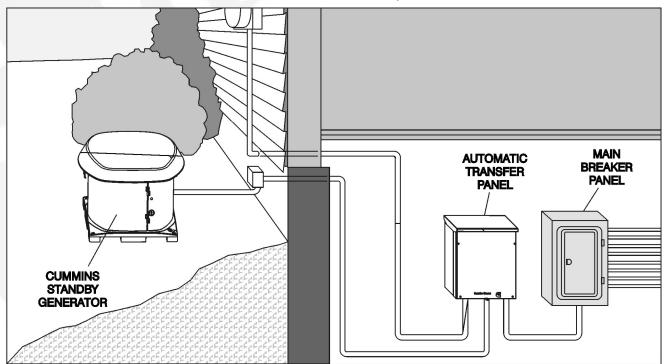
TYPICAL WALL-MOUNT INSTALLATION (SHOWN SCHEMATICALLY IN FIGURE 20)
